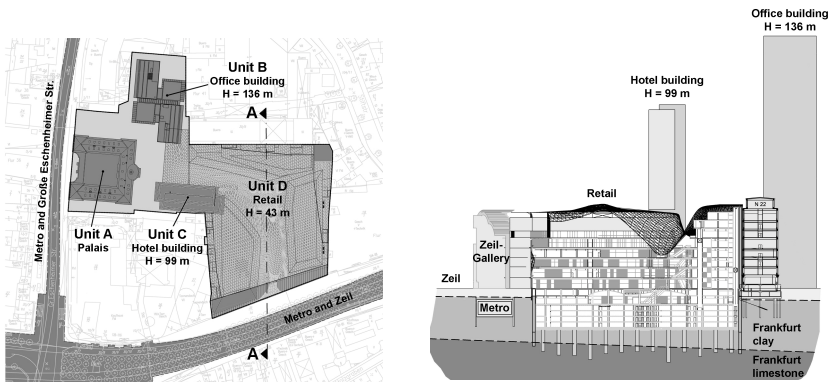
PalaisQuartier complex: plan view (left) and cross-section A-A (right).
